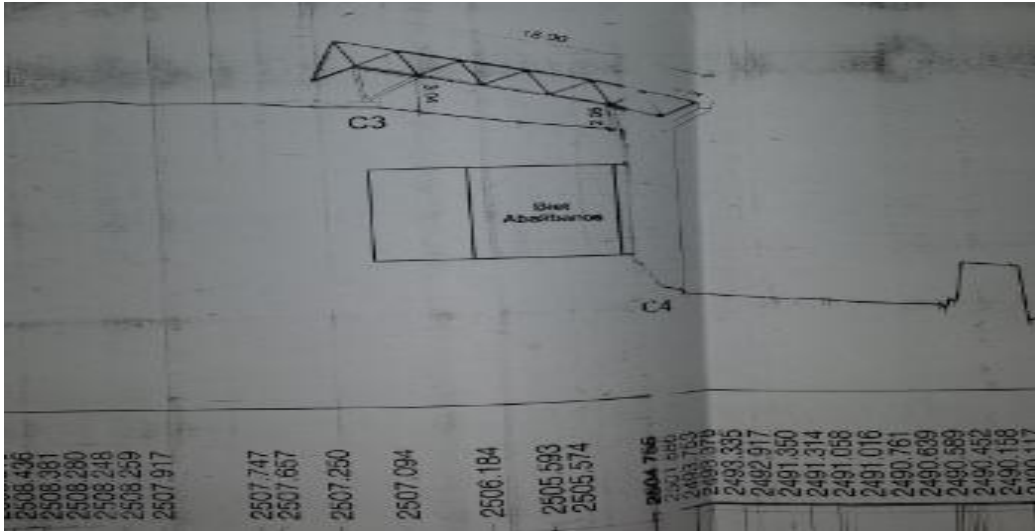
section drawing for shelter-A (source from ARCCH, working drawing)
